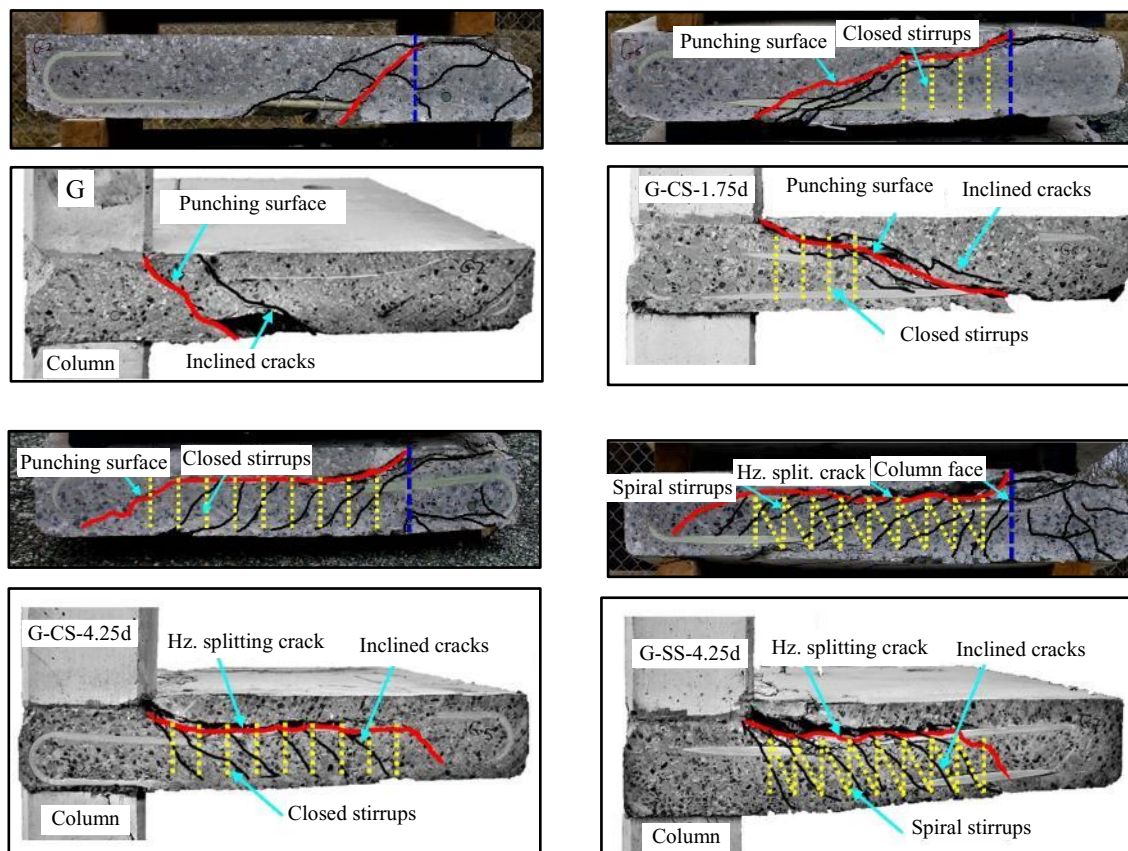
Inclined shear cracks and failure envelope on the two parts of cut sections
